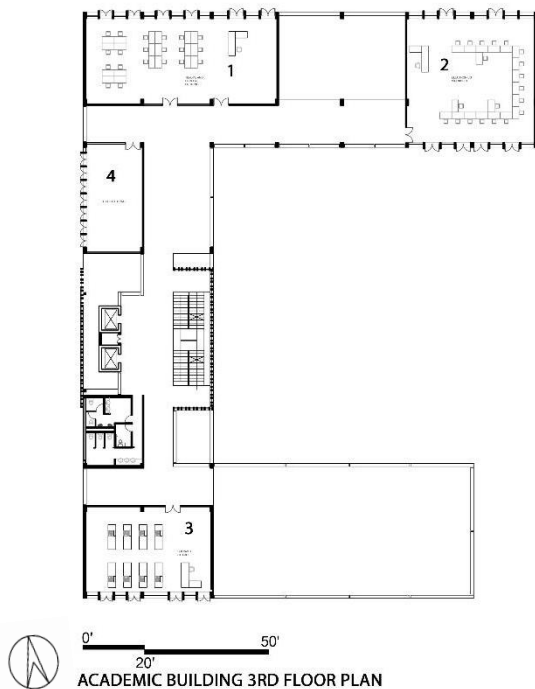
Academic building floor plan blow ups (Source: Author)
